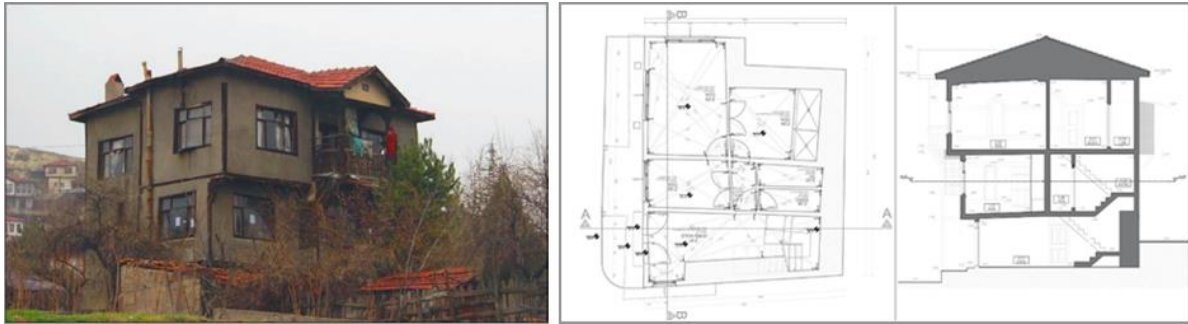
Mehmet Üsdün House (left) and Ground floor plan / A-A section (right)
